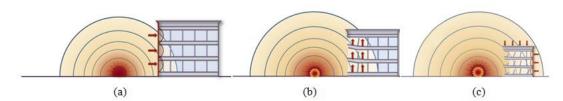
(a), Blast wave breaks windows structure in columns may be damaged, (b) Blast Wave break by forces floors upward, and (c) Blast wave surrounds structure pressure on all sides [2].
